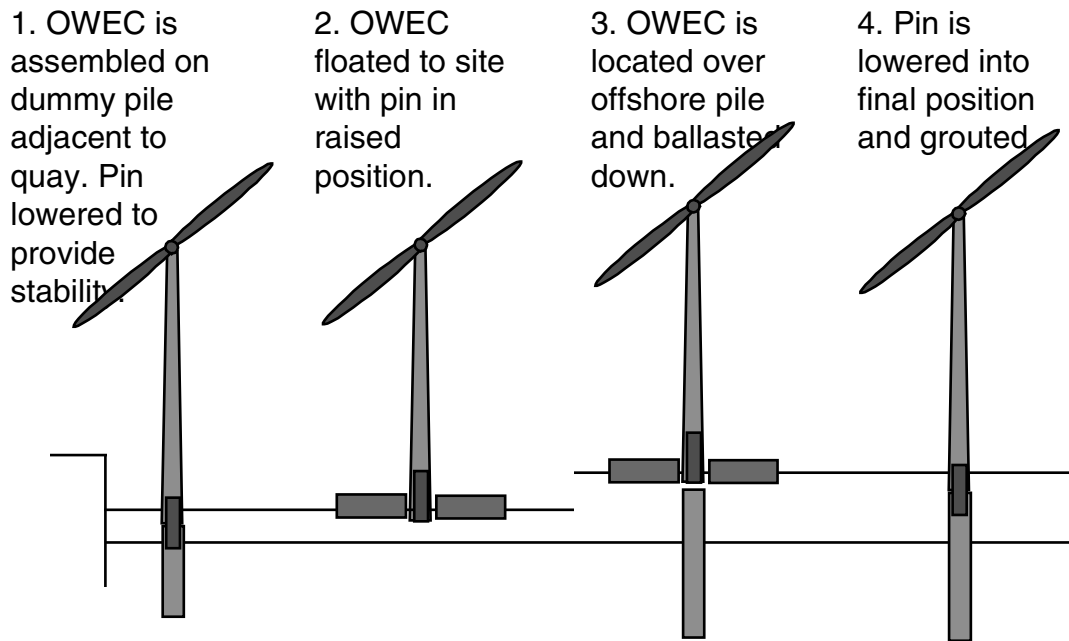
OWEC Fabrication and Float-Over Installation
